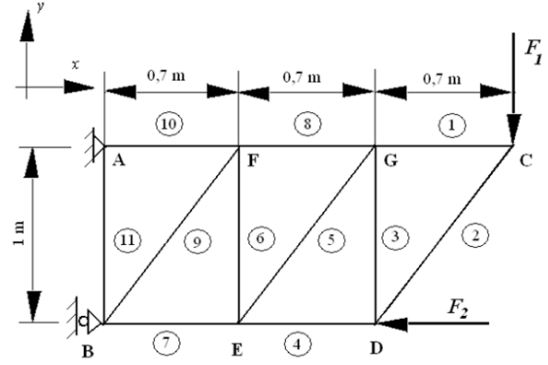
The structure of truss girder "A", the forces are vertical and horizontal
